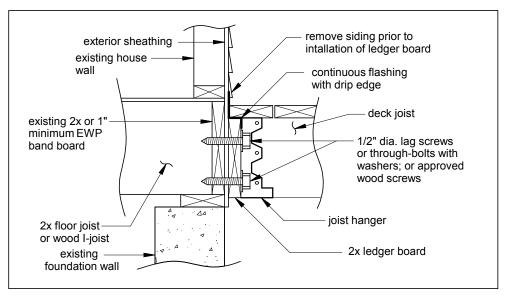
ATTACHMENT OF LEDGER BOARD-TO-BAND BOARD
